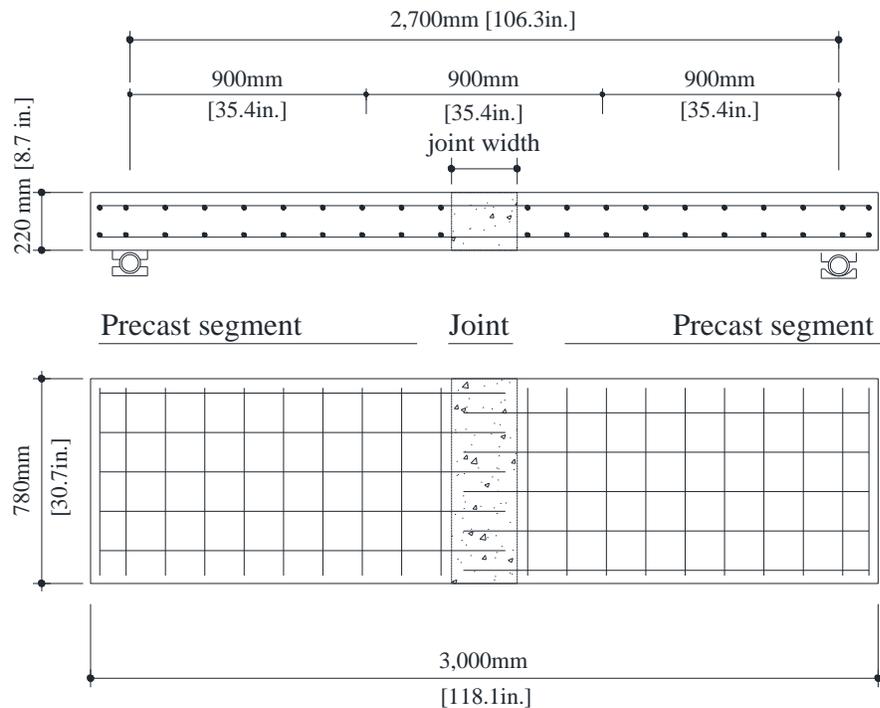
Geometry of the precast beam specimens (Note: 1 in. = 25.4 mm)
